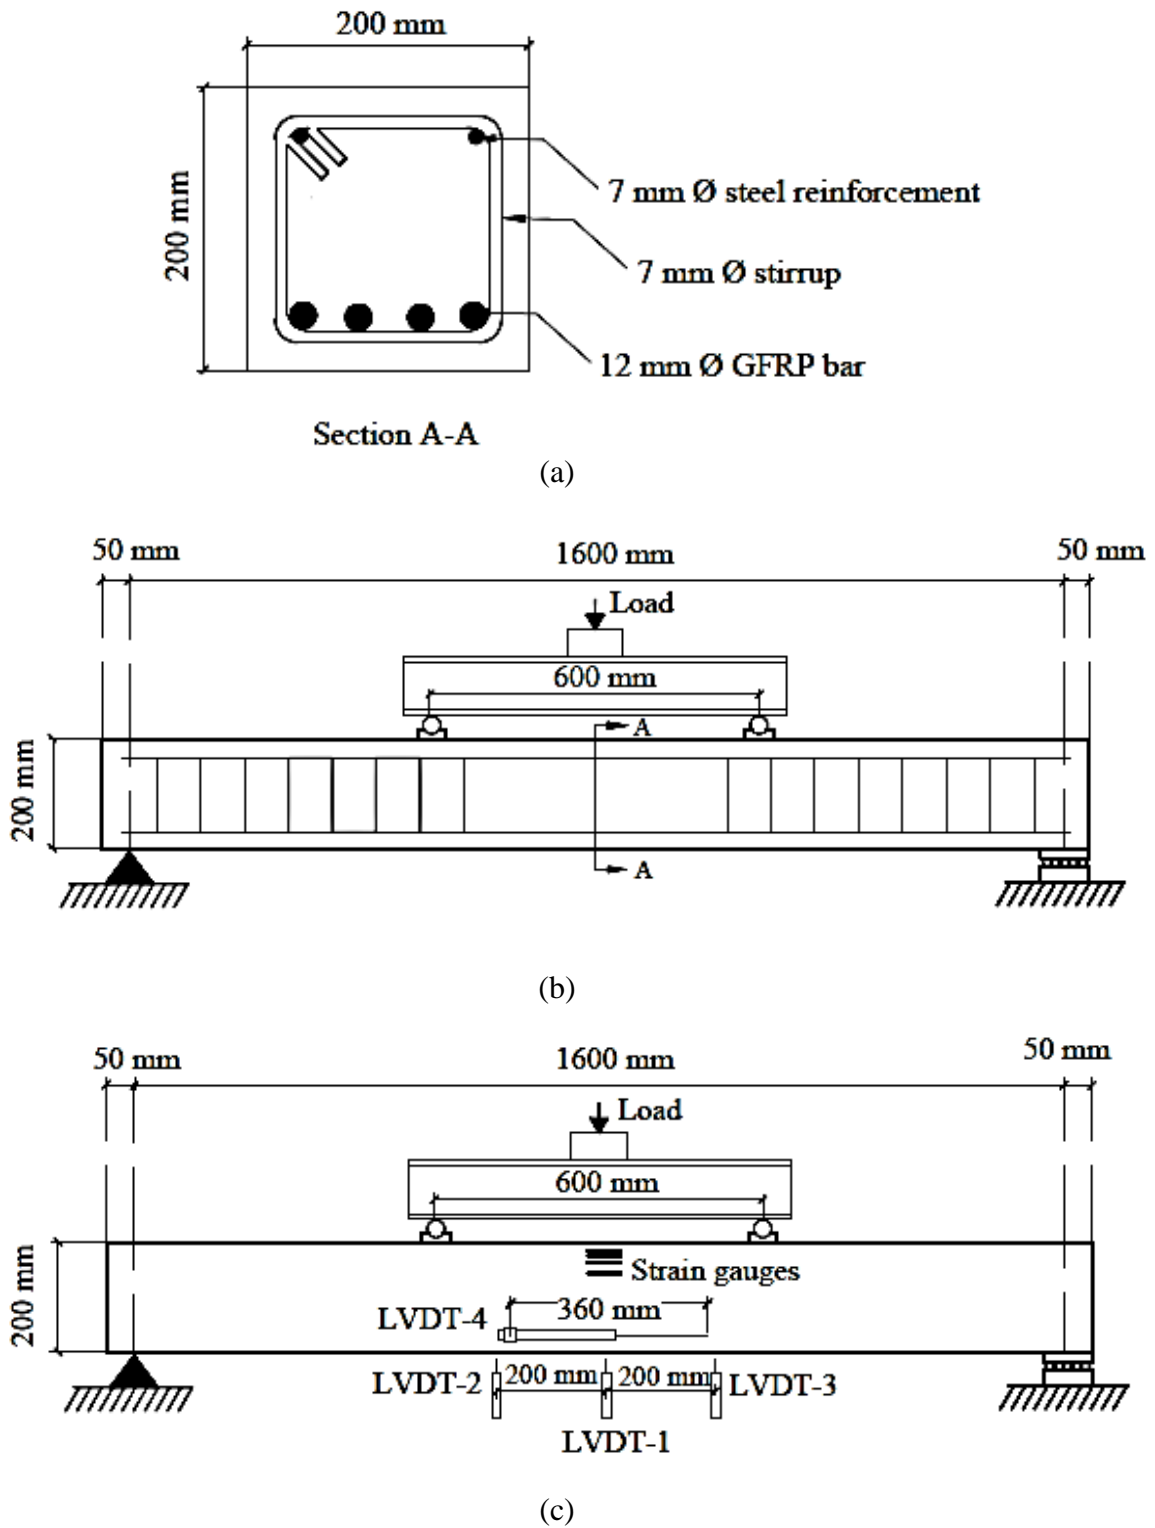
Details of beam specimen and test set up: a) details of beam cross-section; b) details of the beam specimen; c) test set up
